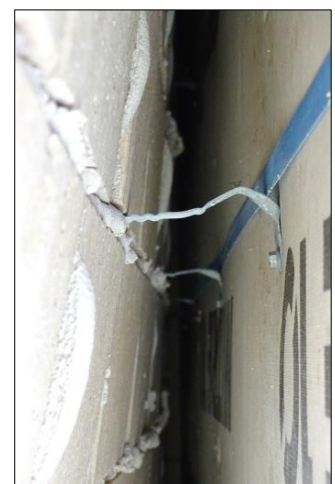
Examples of in-plane and out-of-plane damage to hollow concrete block masonry veneer dwelling, Waiiau (hPGA 1.124g, vPGA 3.216g – WTMC).
